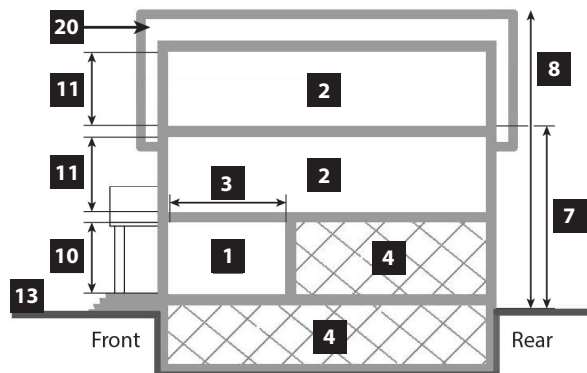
Row building height and use diagram shown with basement and rear building interior parking, porch entry type, and pitched roof type. Not to scale.
